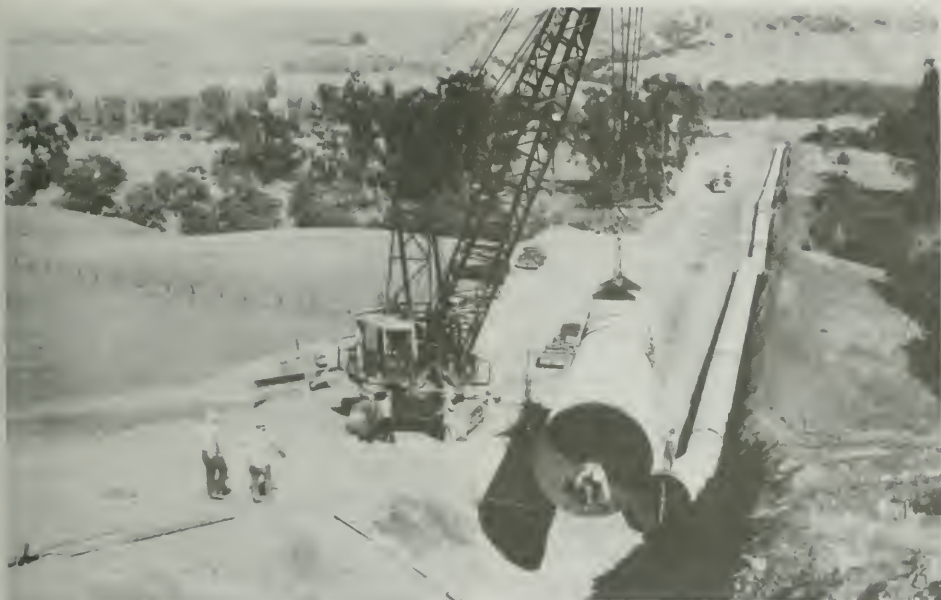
Lowering Pipe Into Trench—Del Valle Pipeline
